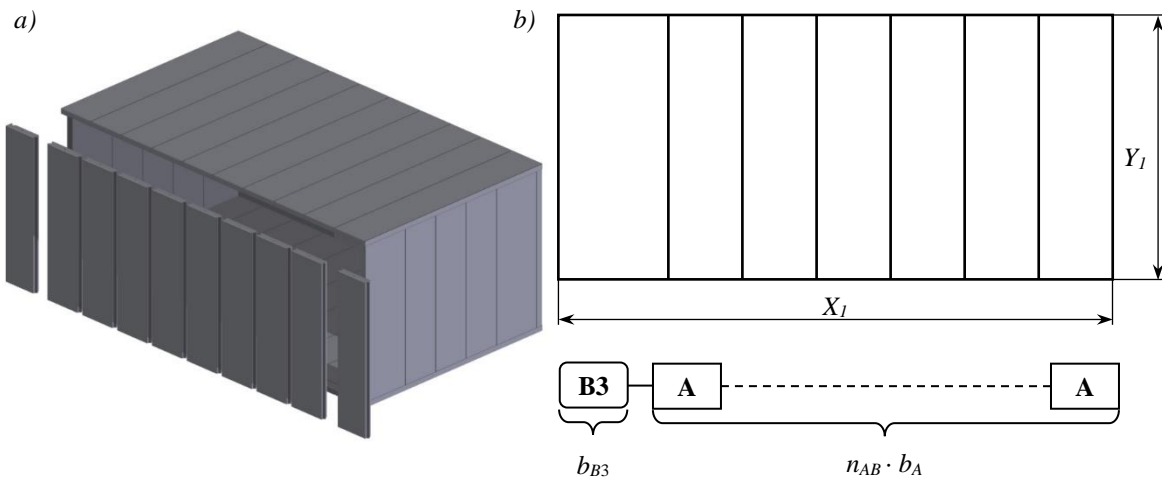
a) 3D view of the disassembled MSR back wall; b) MSR back wall structure and parameters
